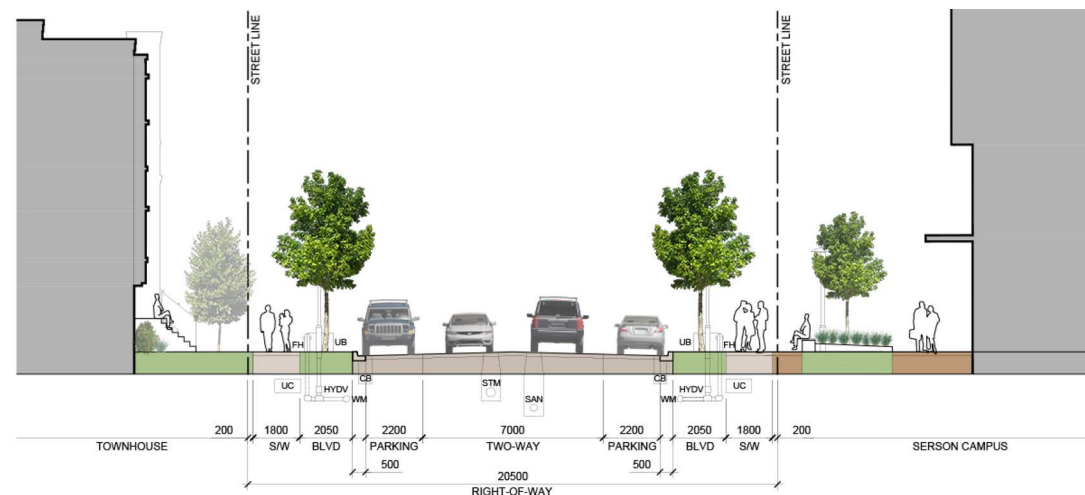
New Haig Boulevard 20.5m R.O.W.
